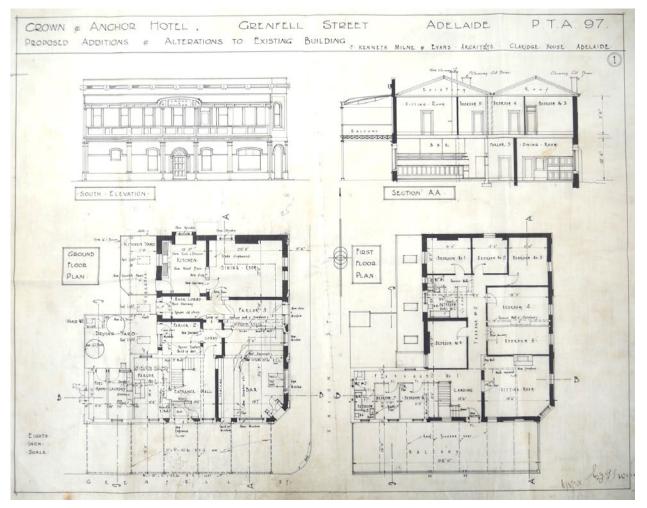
Plans for remodelling of the Crown and Anchor Hotel, 1927. Source: University of South Australia, Architecture Museum
